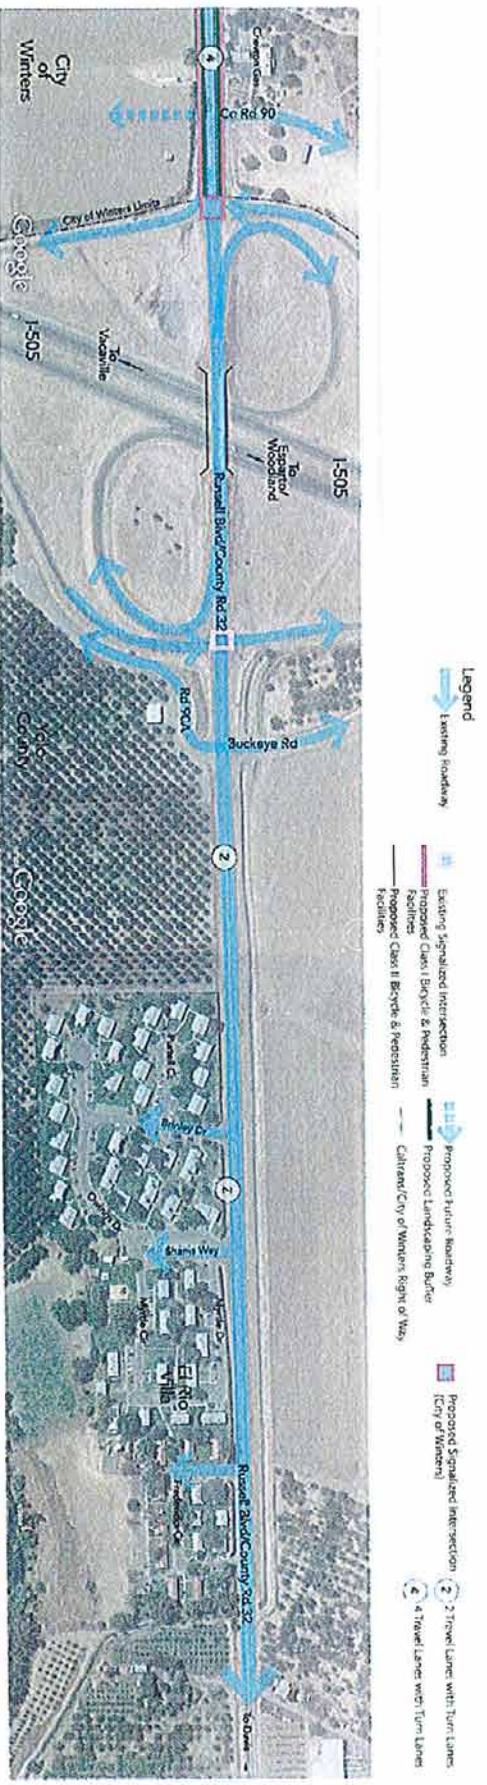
PLAN VIEW OF CORRIDOR WITH GENERAL PLAN IMPROVEMENTS
